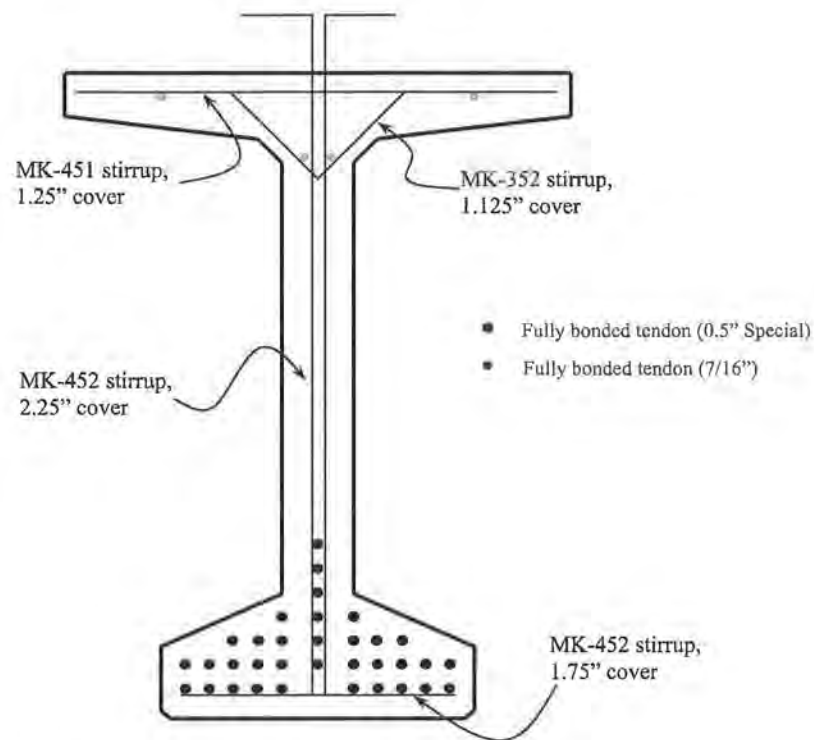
Cross-sectional Configuration of the Vertical Shear Reinforcement at Midspan
